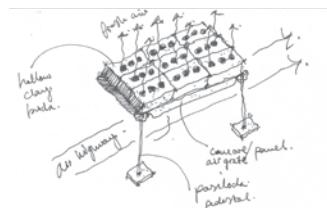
Ventilation concept sketch: movement of fresh air through floors surrounding theatre
